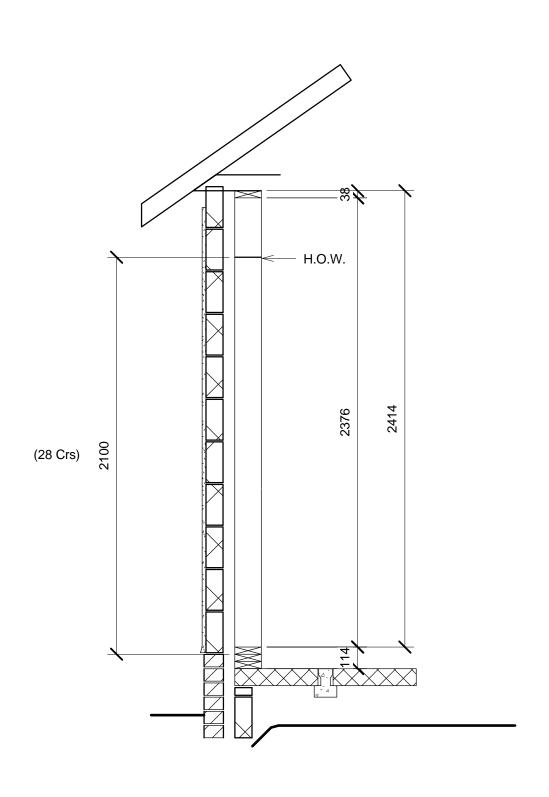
### DETAIL OF STUD WALL TO EXTERNAL WALL REFERENCES ACD TFW-IW-03
